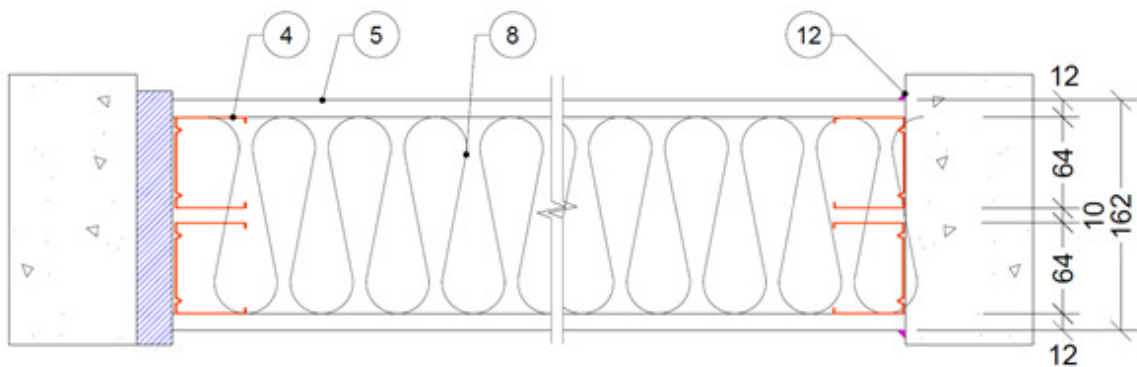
Vertical elevation with 2 x Bradford Acoustiguard insulation batt
